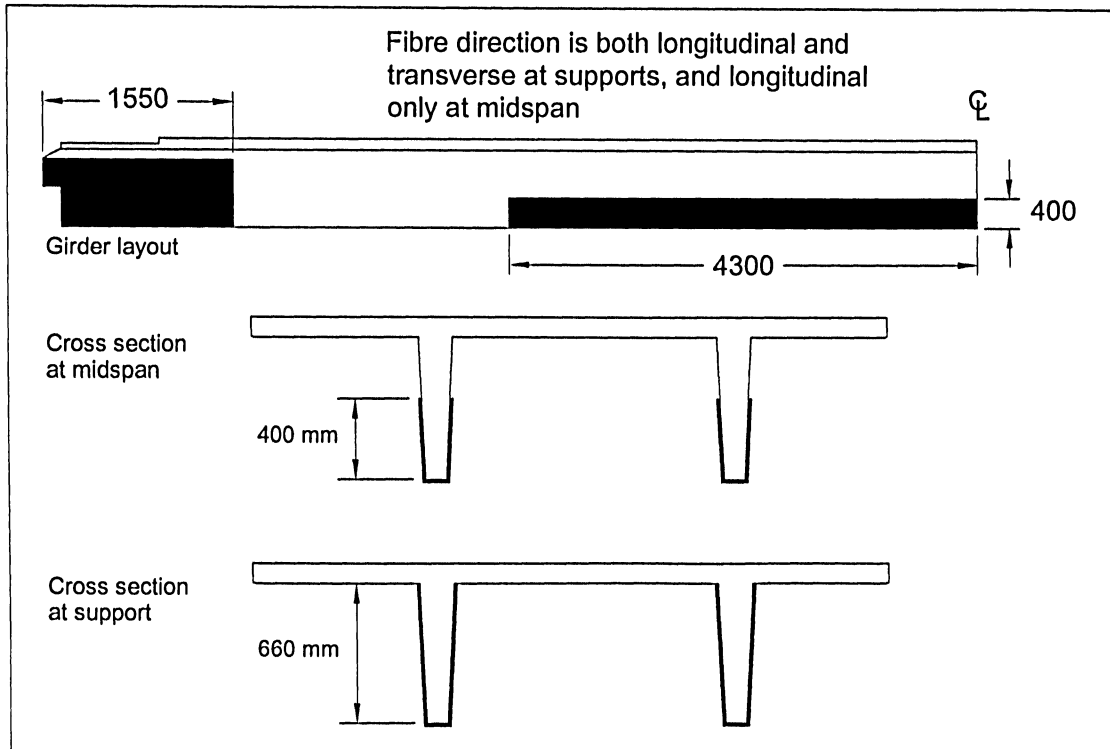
DT-102A girder CFRP layout (Cofini, 2005)
